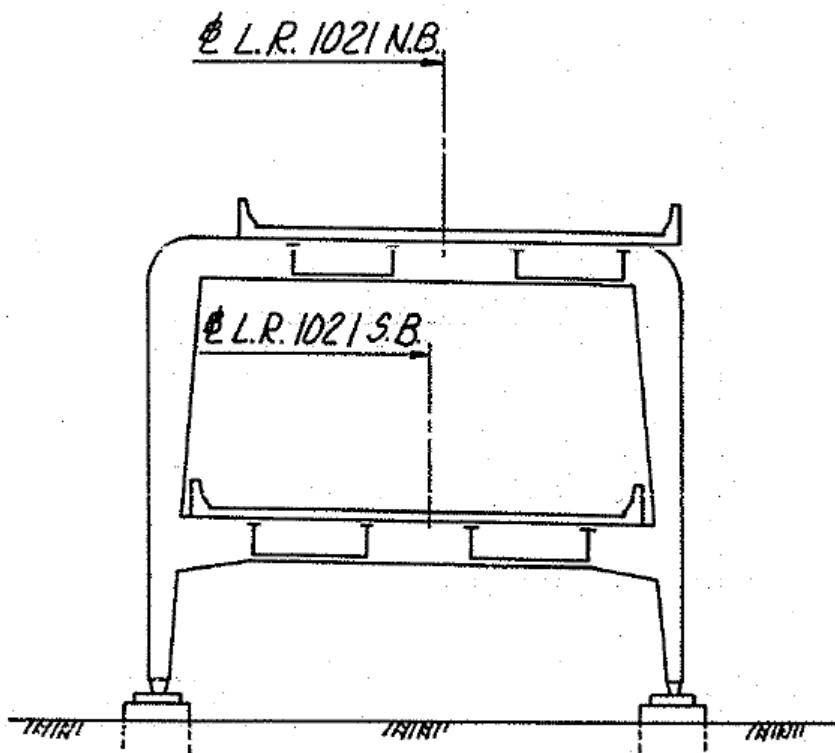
Example of a Bent Supporting Multiple Superstructures
